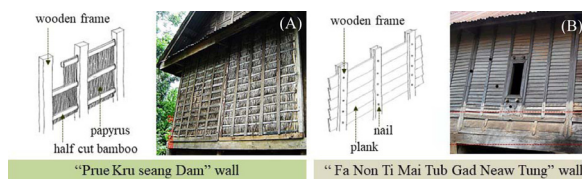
“Prue Kru seang Dam” wall (A) and “Fa Non Ti Mai Tub Gad Neaw Tung” wall (B)
